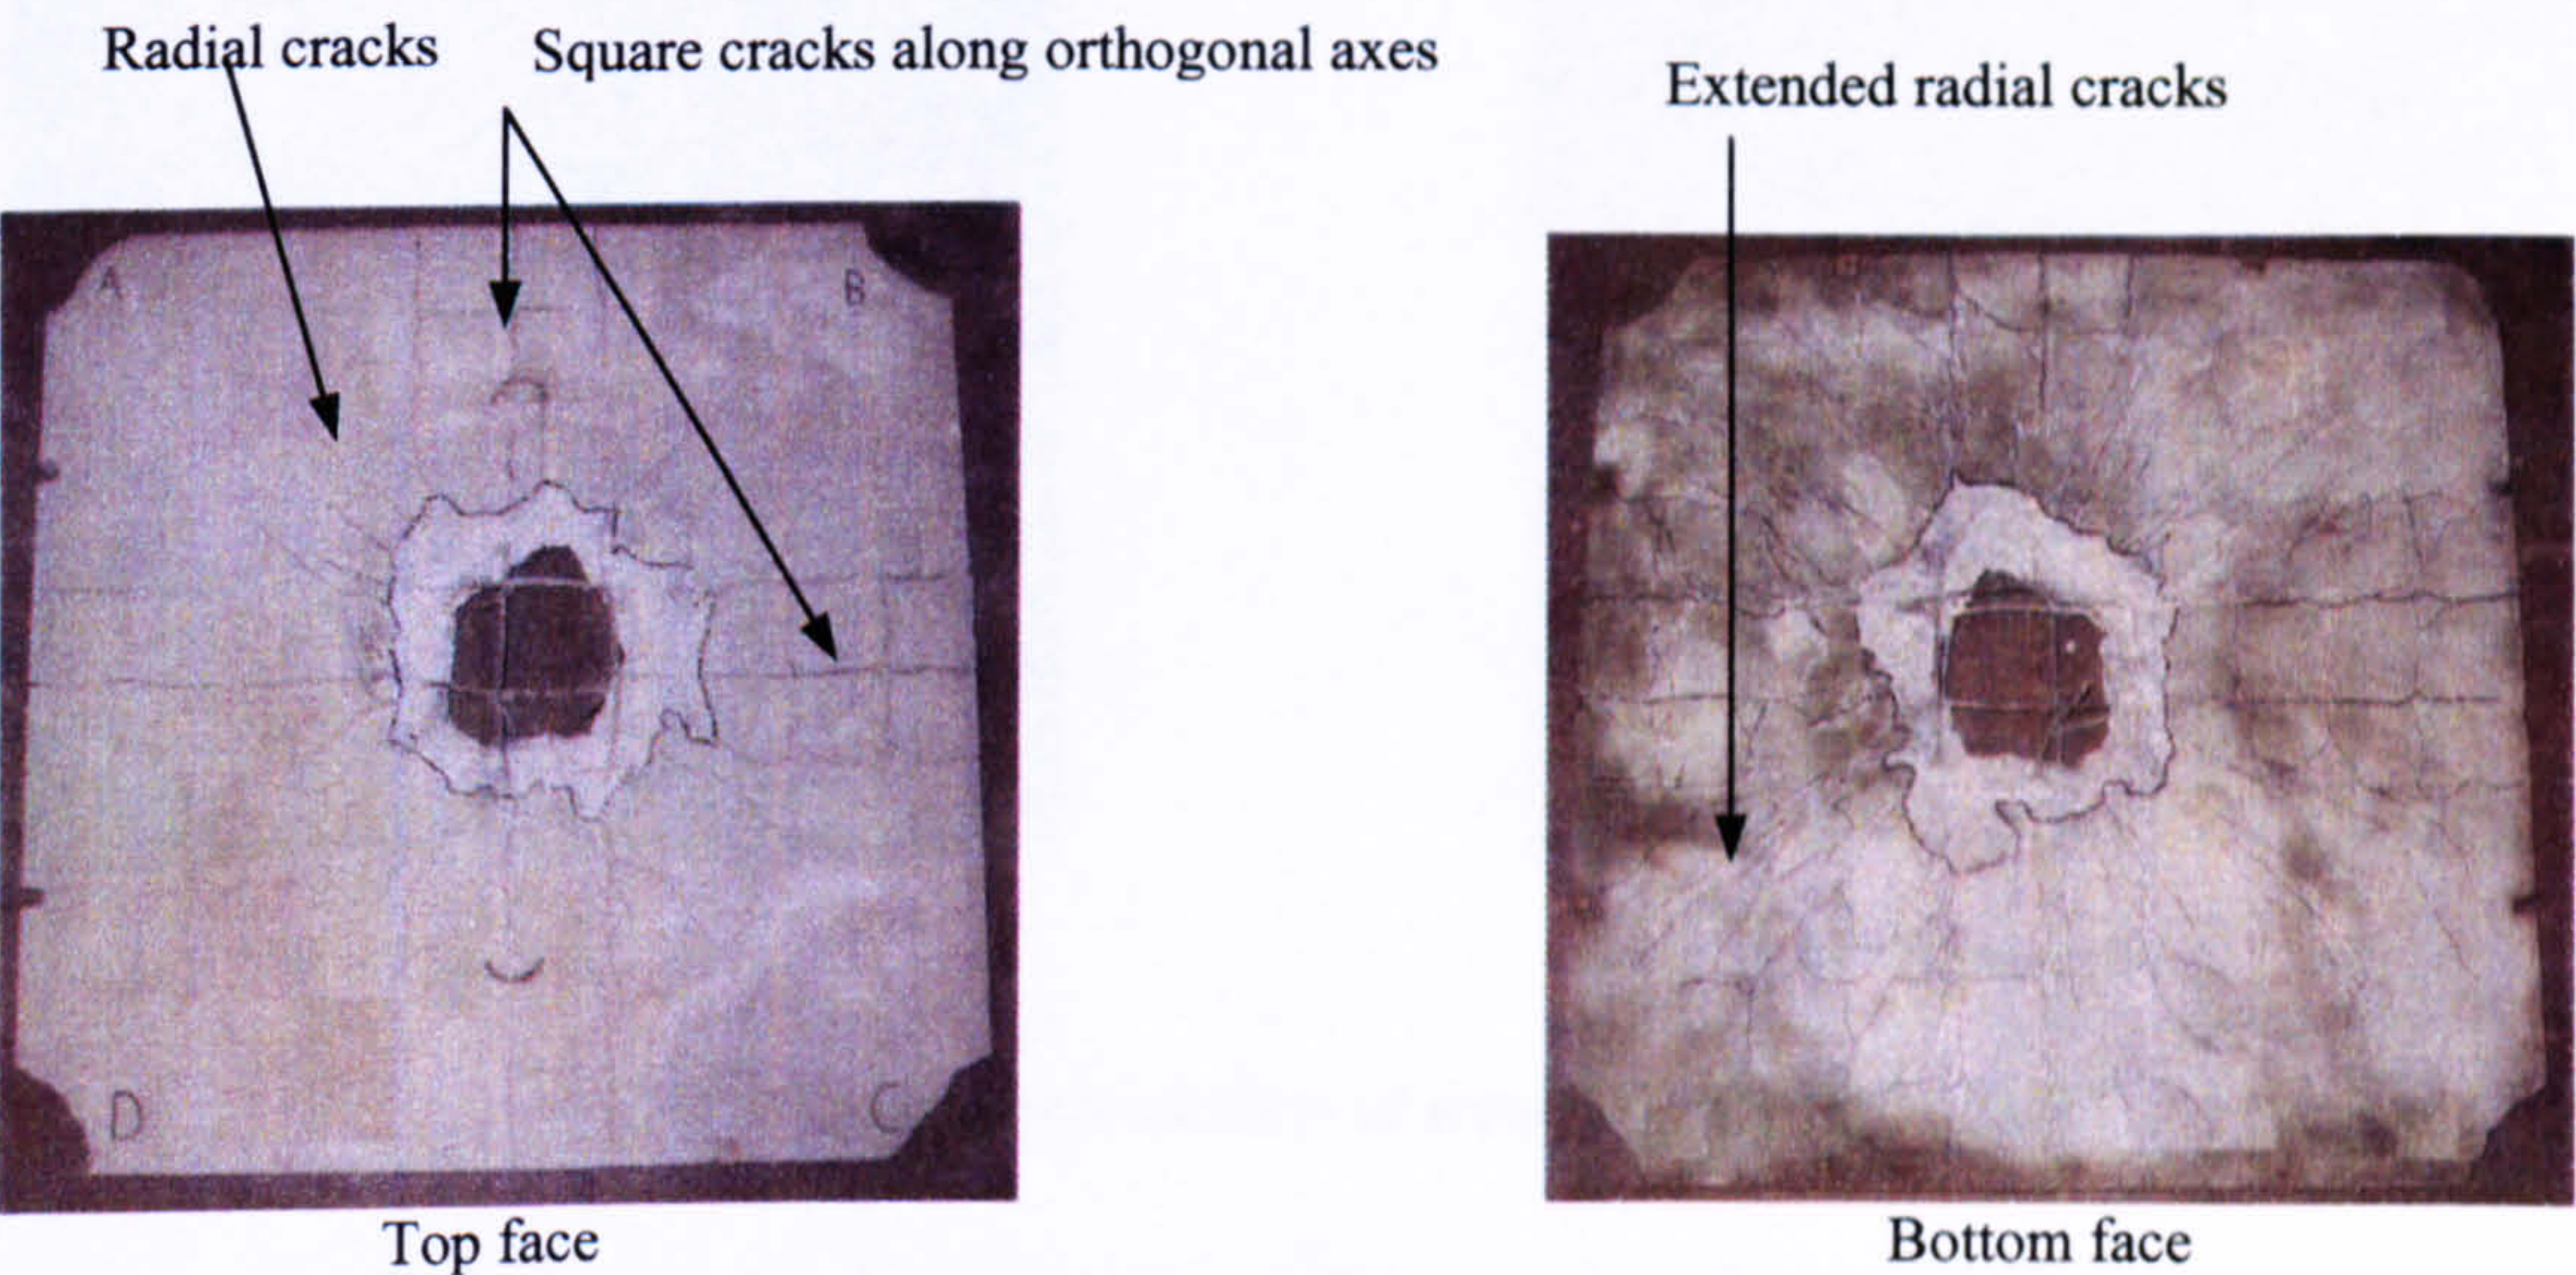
Top and bottom faces of secondary slab RCB73IT6
